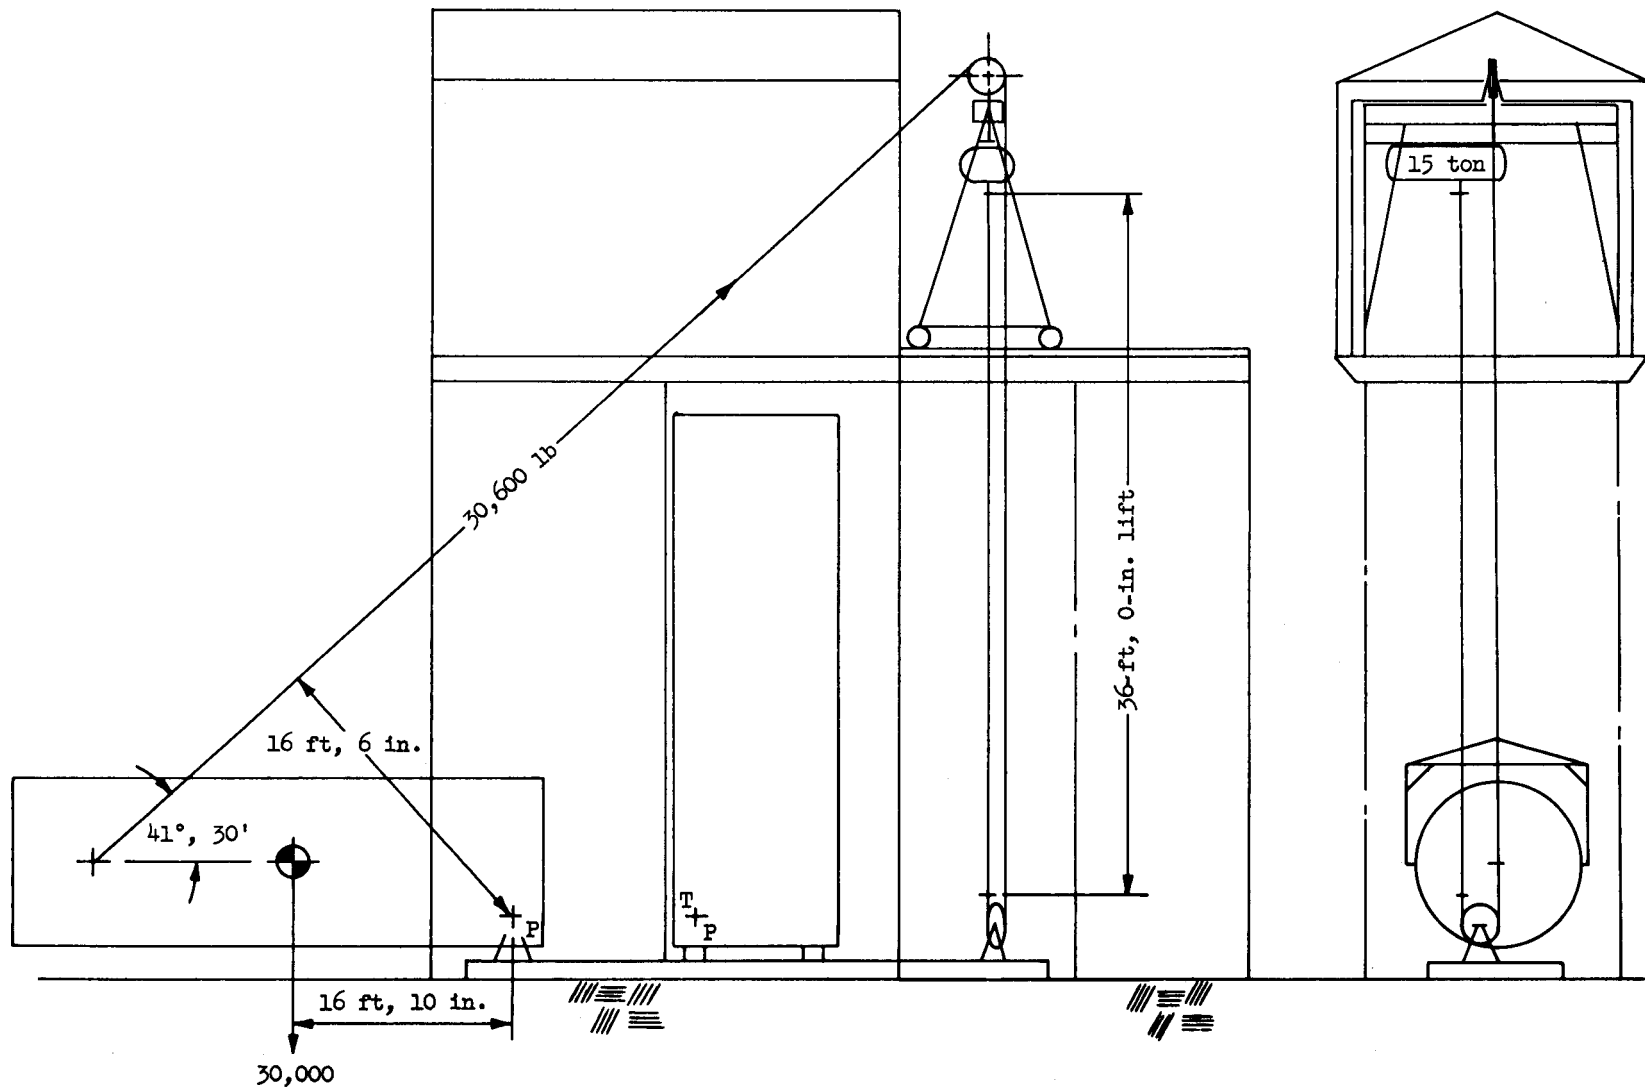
Alternate Method of Hoisting Tanks (steam generator package shown)
